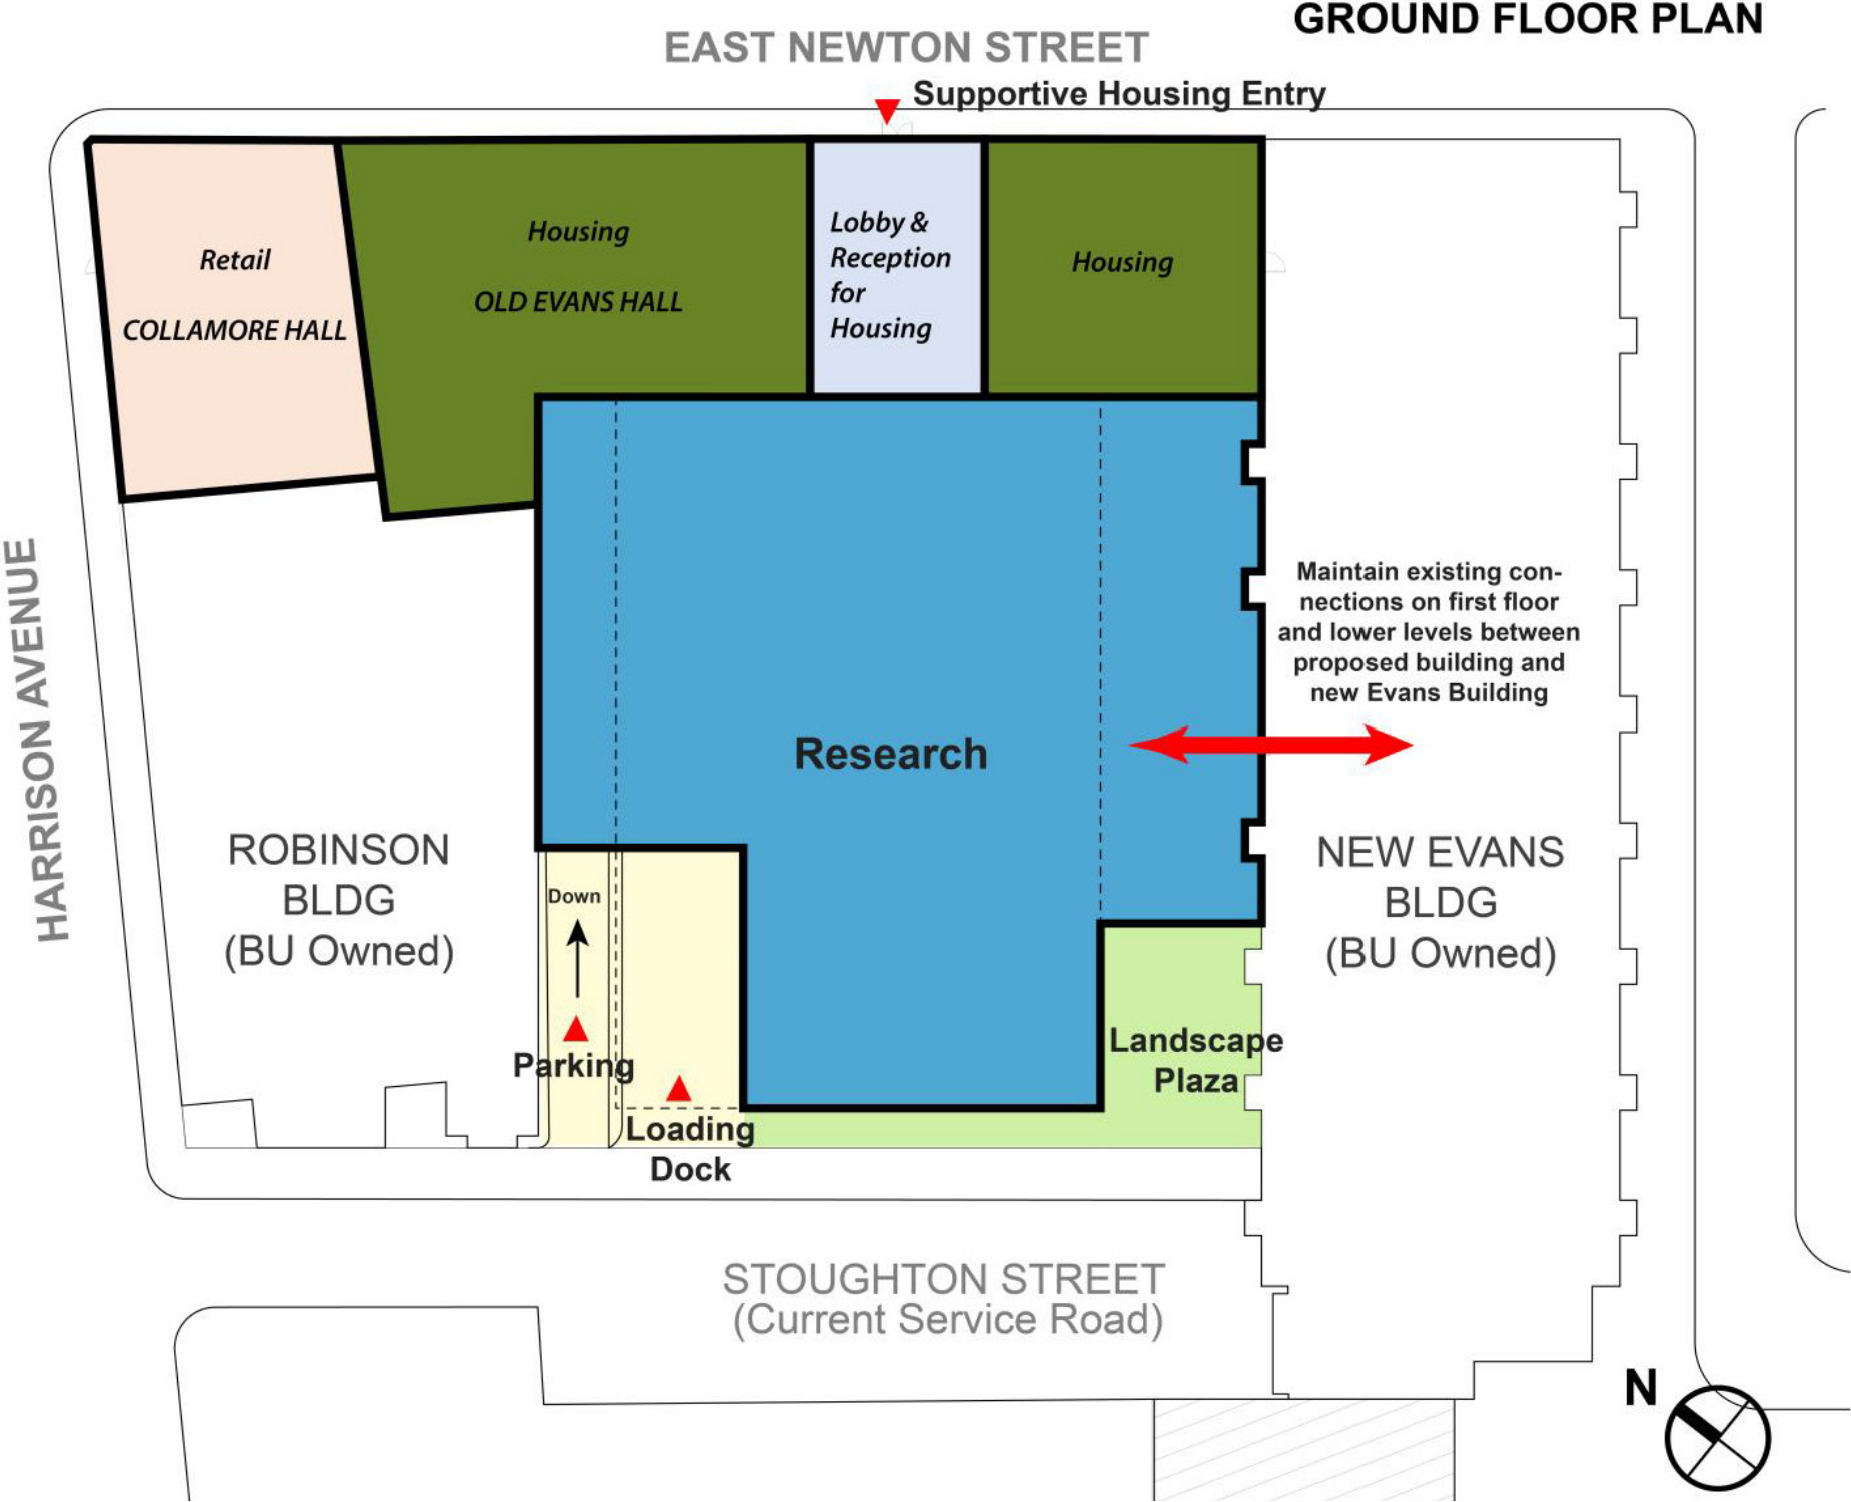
10 Stoughton Street & Collamore/Old Evans Typical Floor Plan
